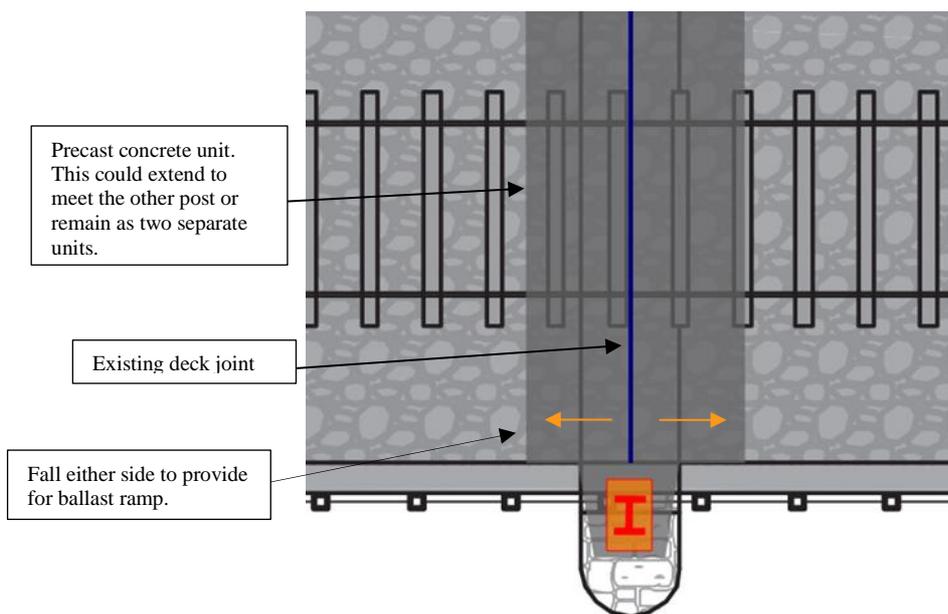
UBB30 – Proposed precast unit option (plan)
